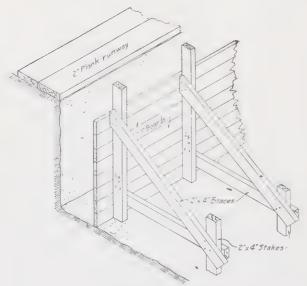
Foundation wall forms below grade. (The embankment serves as the outer form.)
